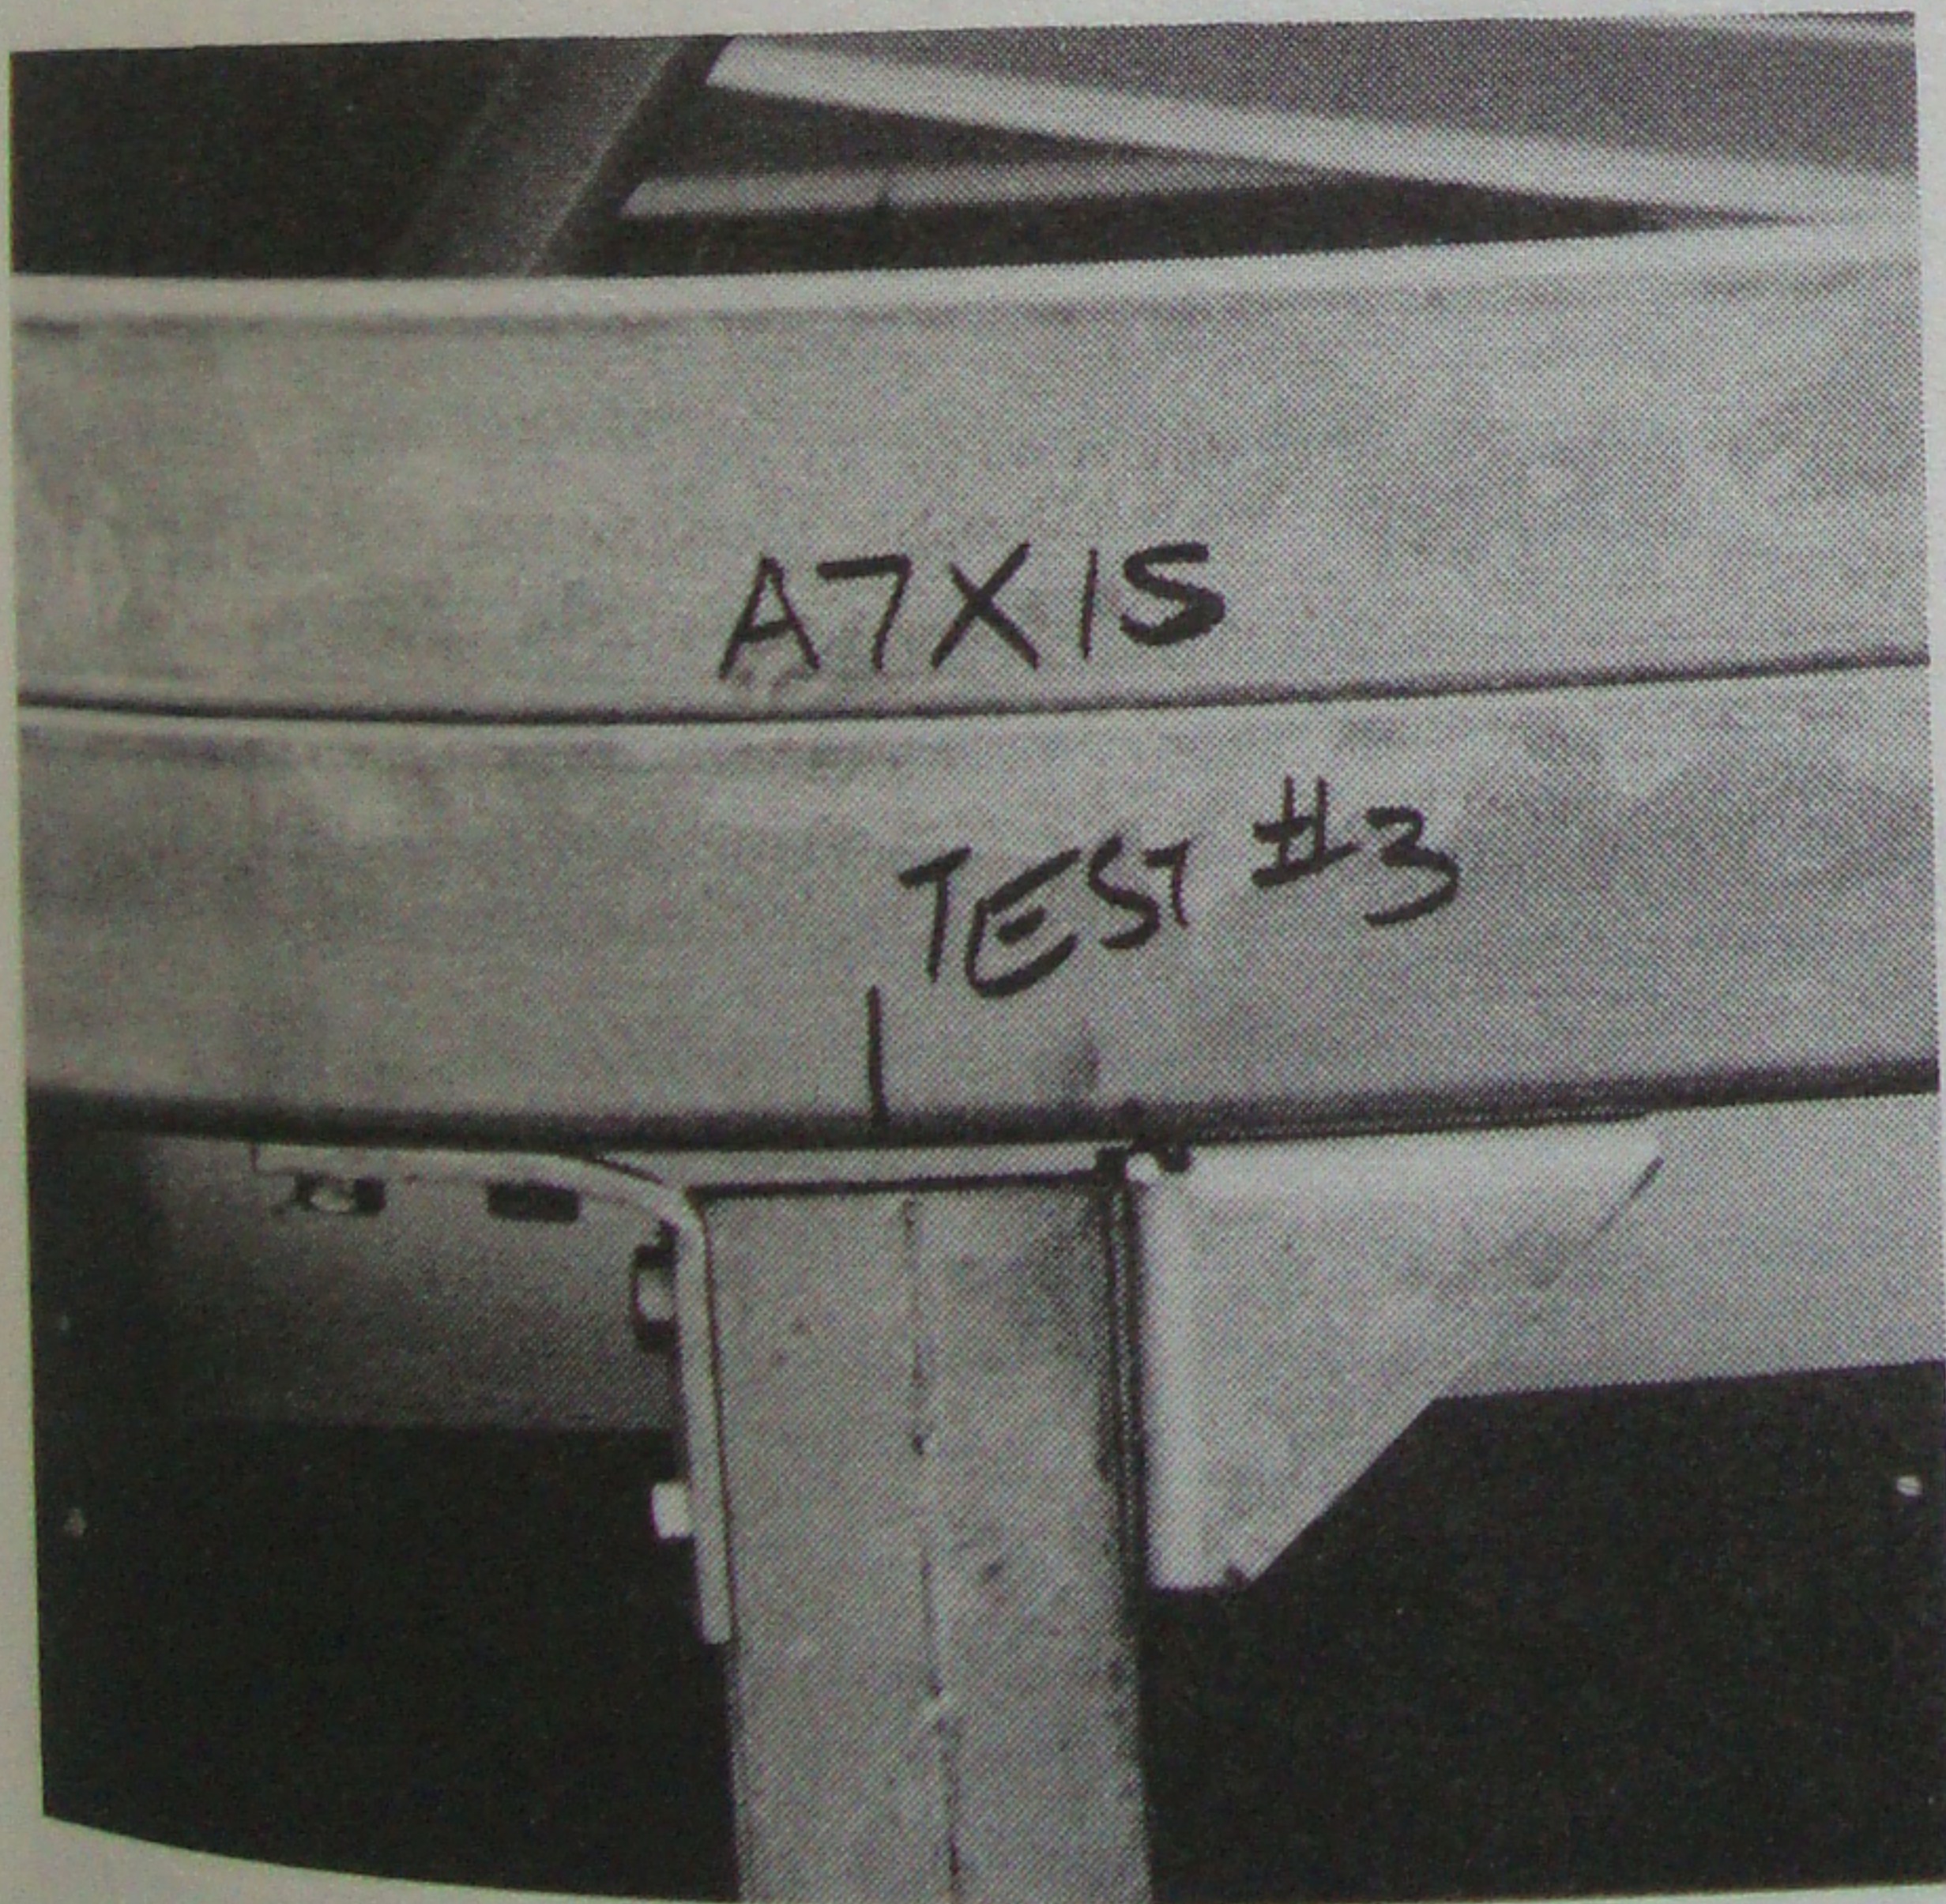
Vertical Hanger Strut Cracked at Gusseted Bracket Side; Brackets Installed Short Leg Vertical
